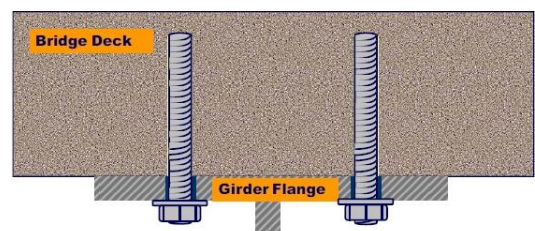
Adhesive Anchor Post-Installed Shear Connectors (2)
